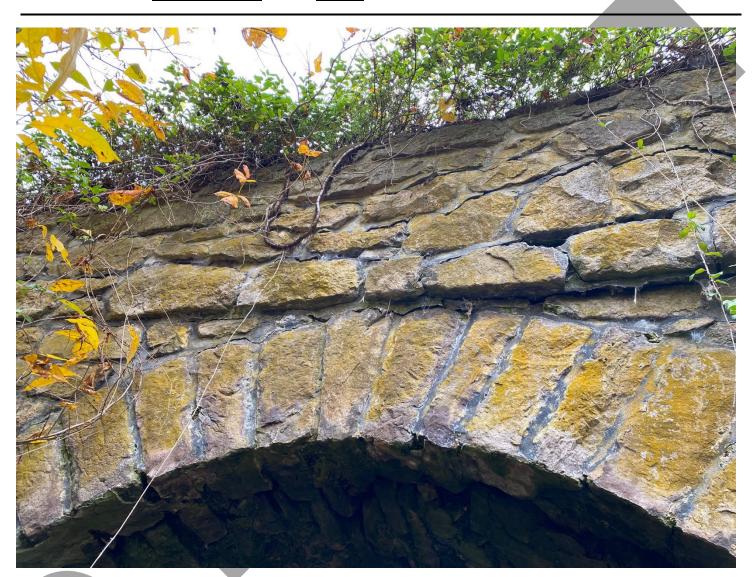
Southwest (downstream) side of the bridge, view looking up at the apex of the arch ring and the cantilevered parapet.
